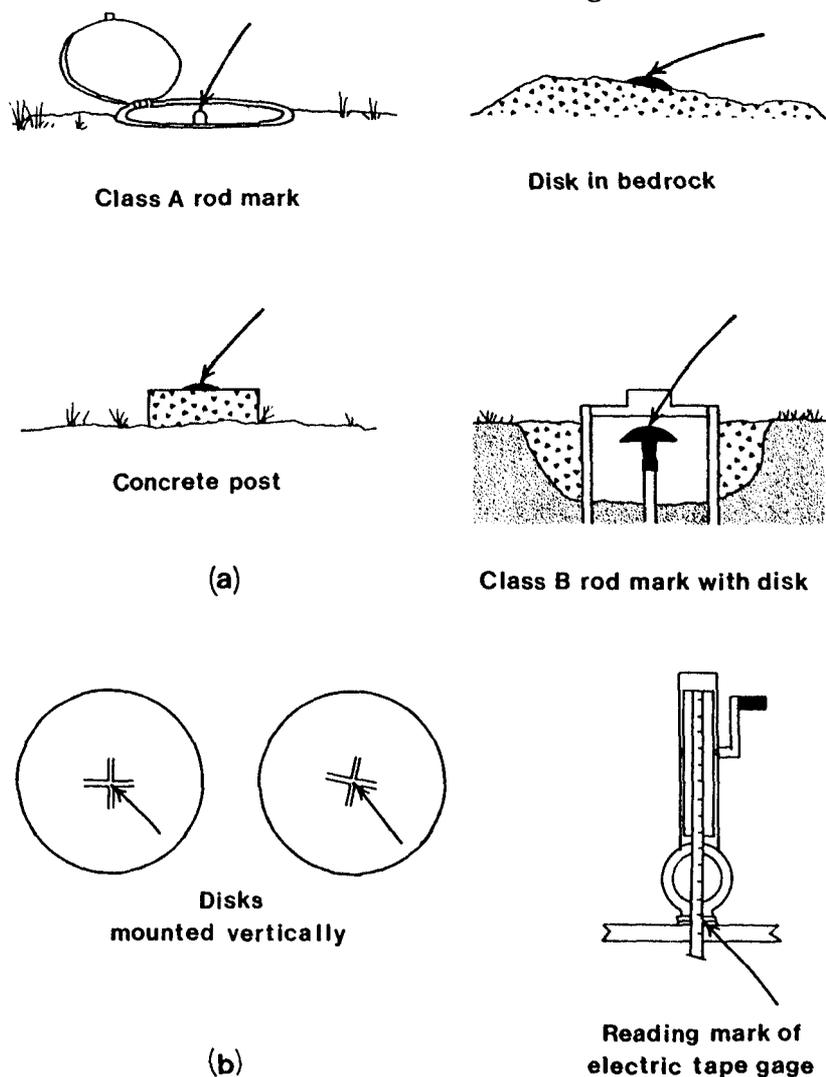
Control points on horizontal surfaces (a) and vertical surfaces (b).
